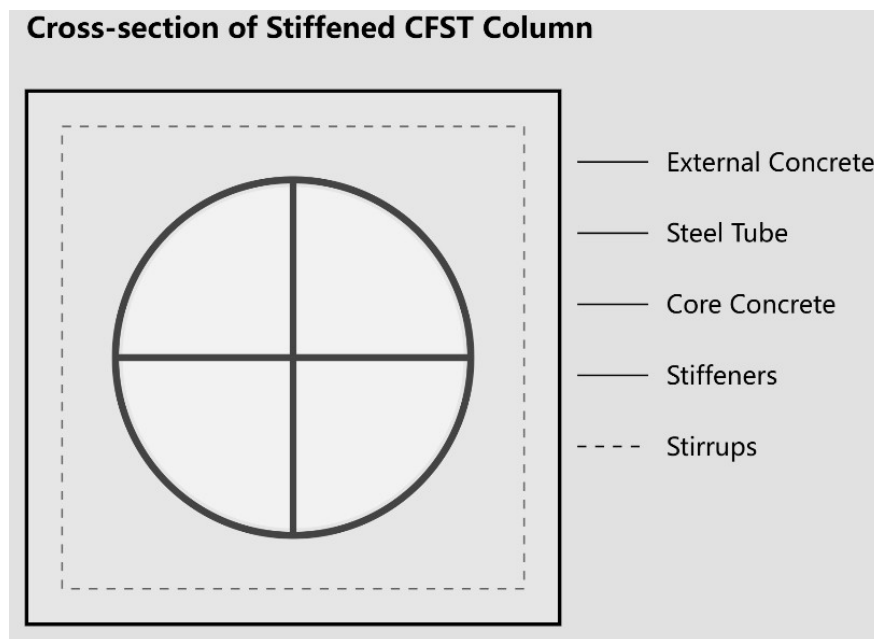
Schematic diagram of stiffened concrete-filled steel tubular composite column
